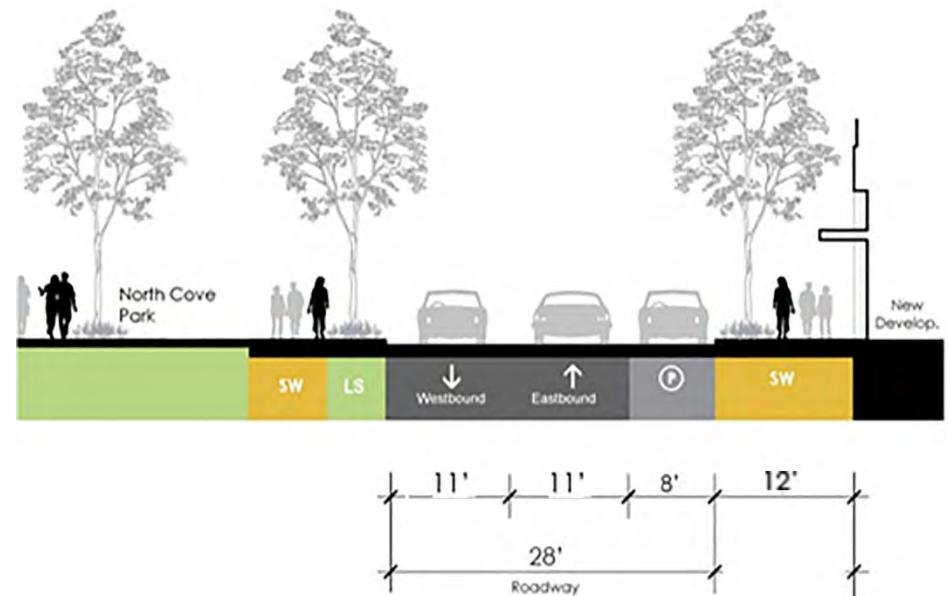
Retail Street Illustration (18th St NE View Looking East to Main Street)
